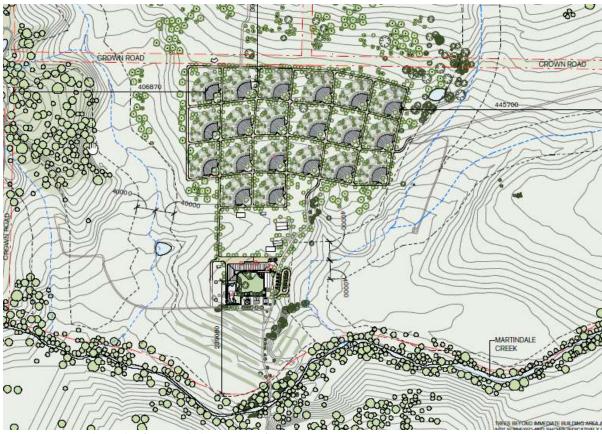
Proposed Site Plan (Proposed Plans, Tzannes)
